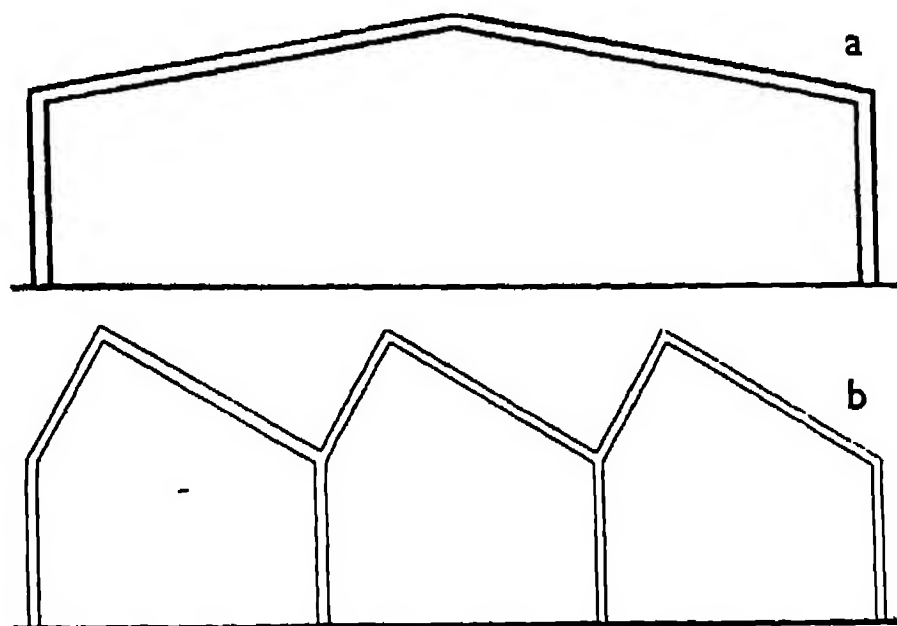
a, single-span symmetrical rigid frame roof; b, multi-span "north-light" rigid frame roof
